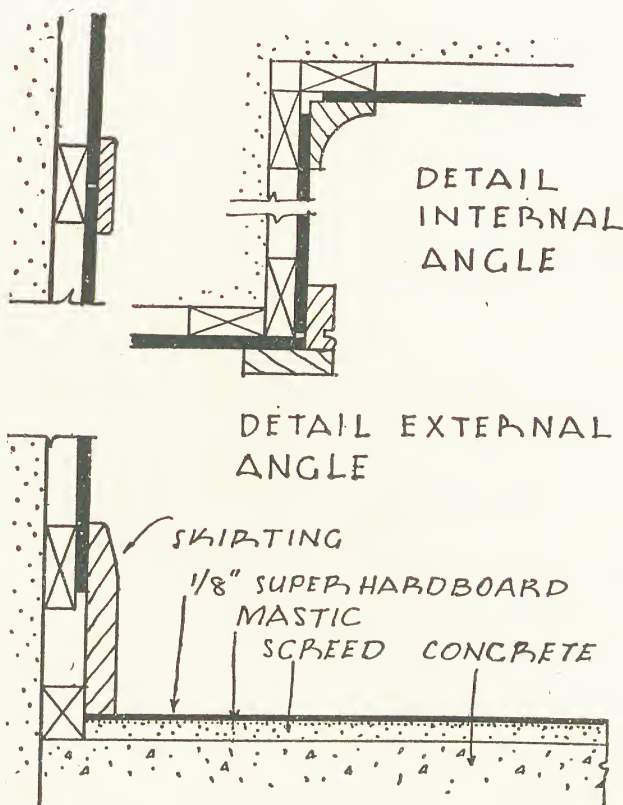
Details of wall-board fixing. Bottom detail shows hardboard used as flooring, bedded in mastic on cement screed.
